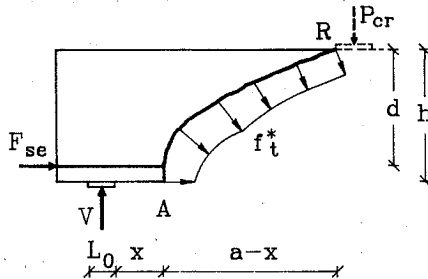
State of forces and stresses for maximum cracking moment in a prestressed beam
